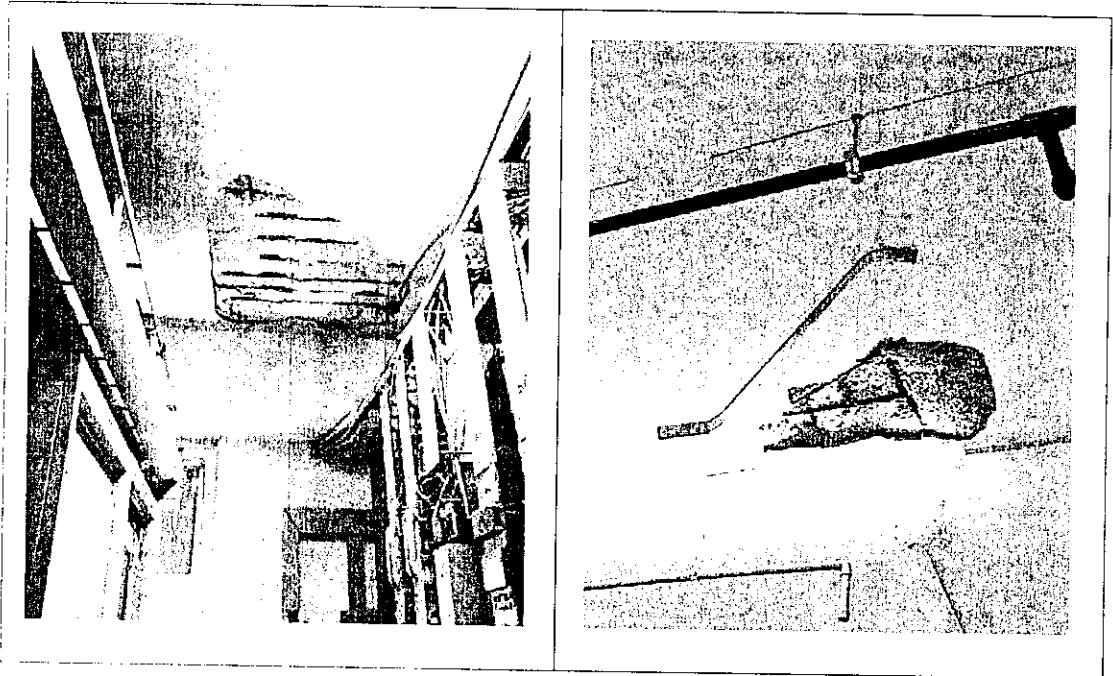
Exposed steel and deteriorated concrete in local slabs (e.g. 11th floor)
